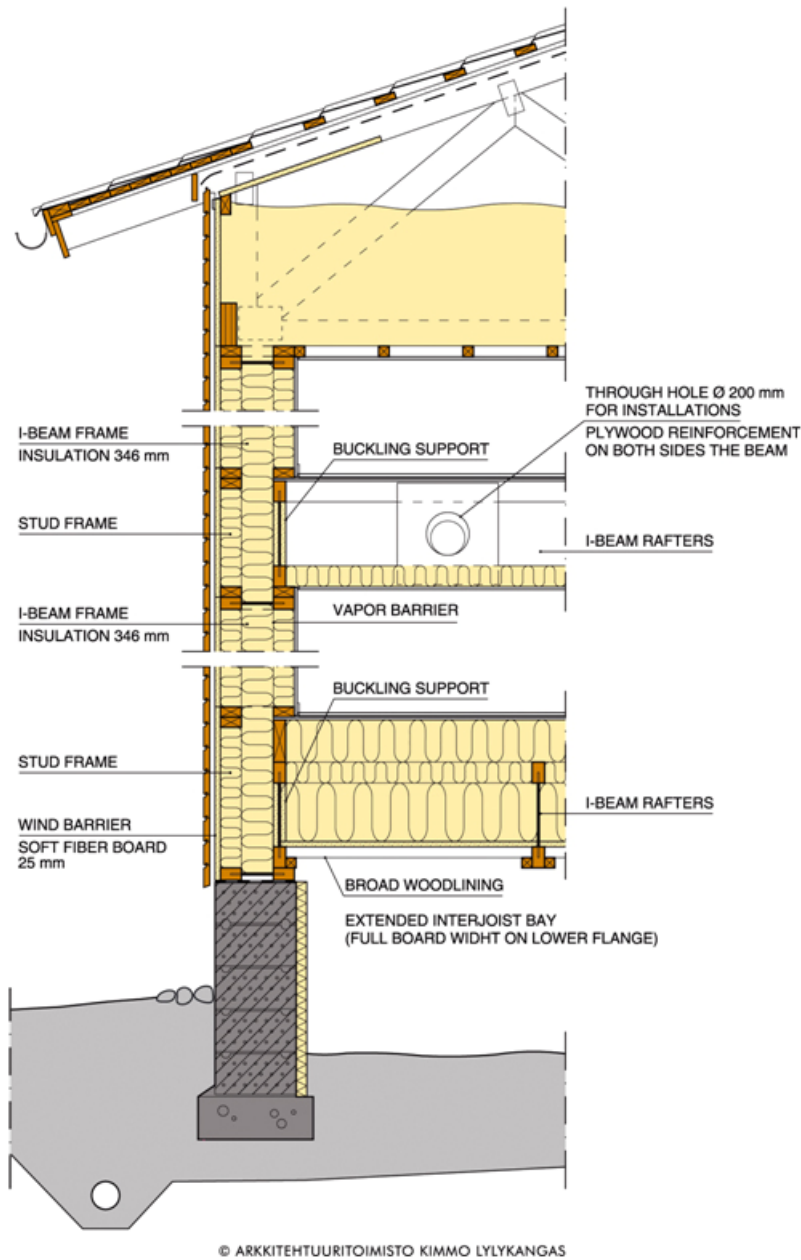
Building envelope’s thermal properties need to be accurate for heating system design.
